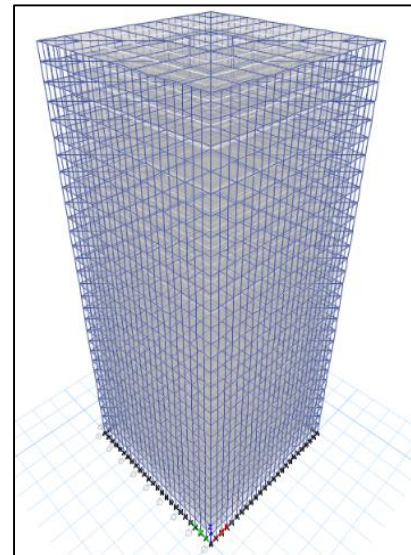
3D Elevation of Tubular Steel Structure
